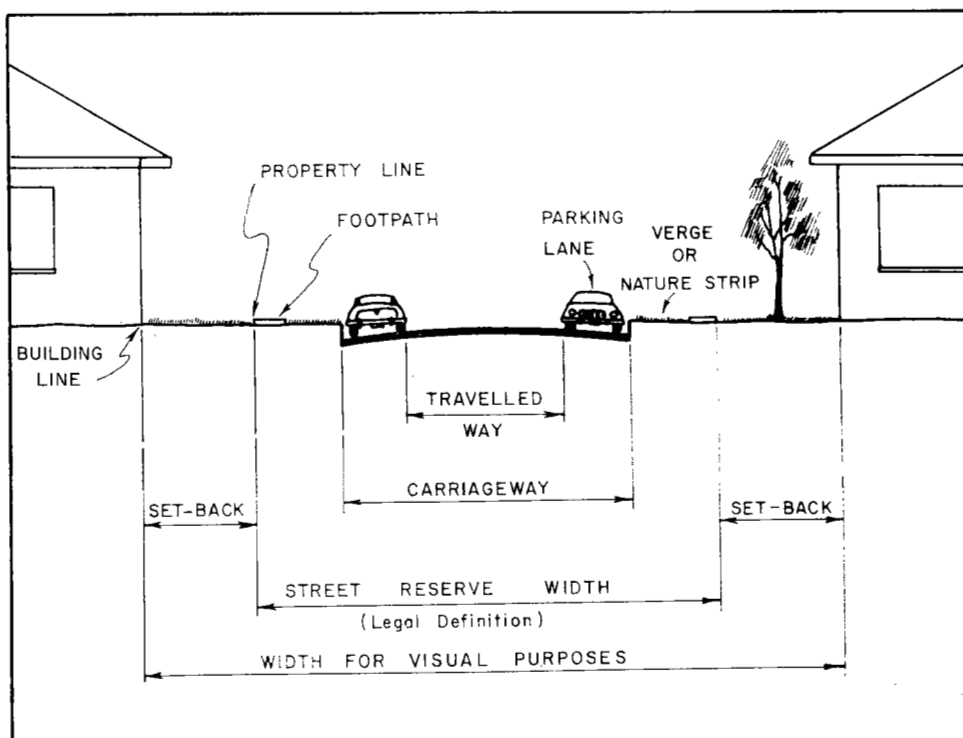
THE STREET IN CROSS-SECTION
